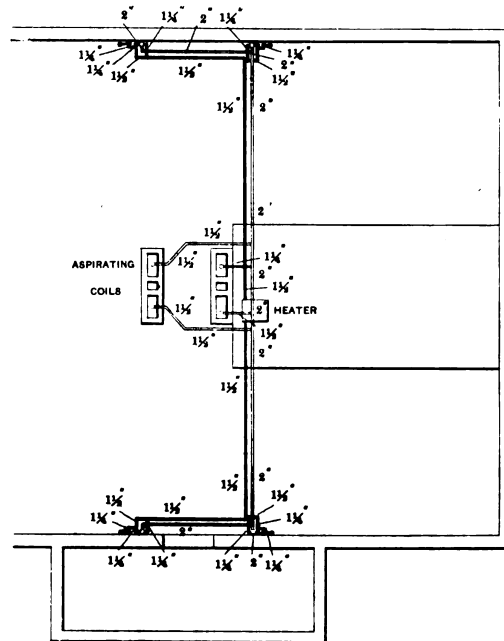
Partial Plan, Showing the Boiler and Piping Under the Building.
